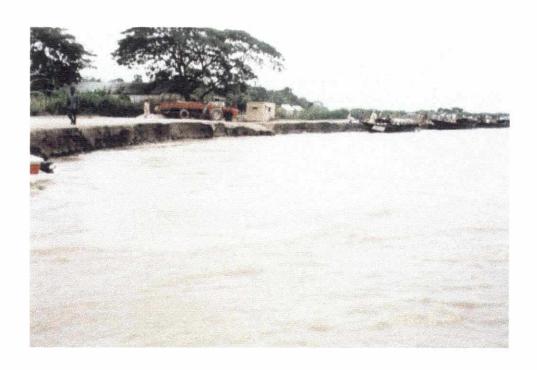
Situation in front of sugar cane building and FAP 21 container as on August 24, 1999;
